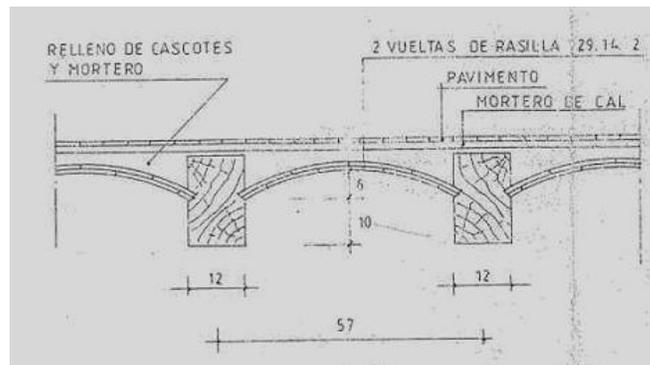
Detail of the slab with wood beam and ceramics ceiling vaults (taken from the original architectonic plans of the building).
